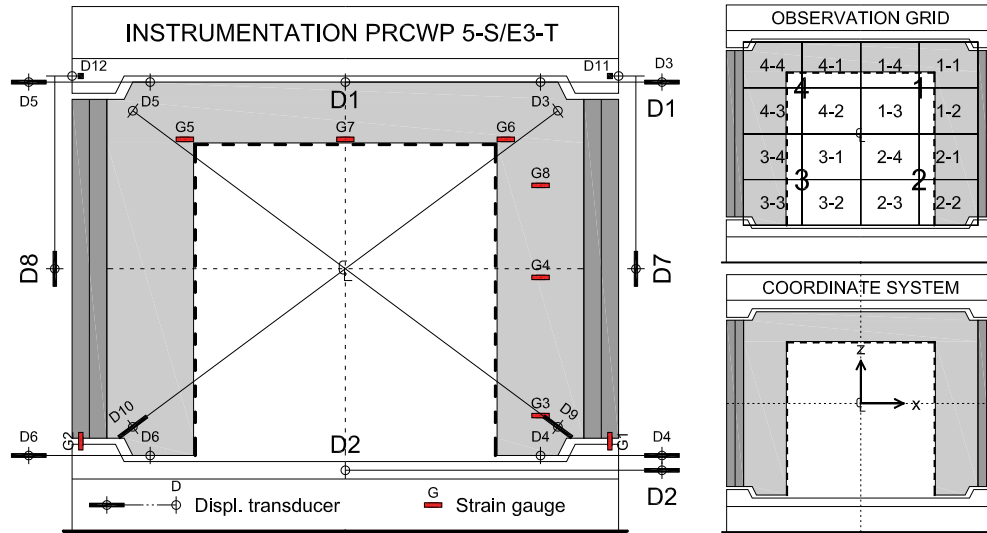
Instrumentation layout of specimen PRCWP 5-S/E3-T
